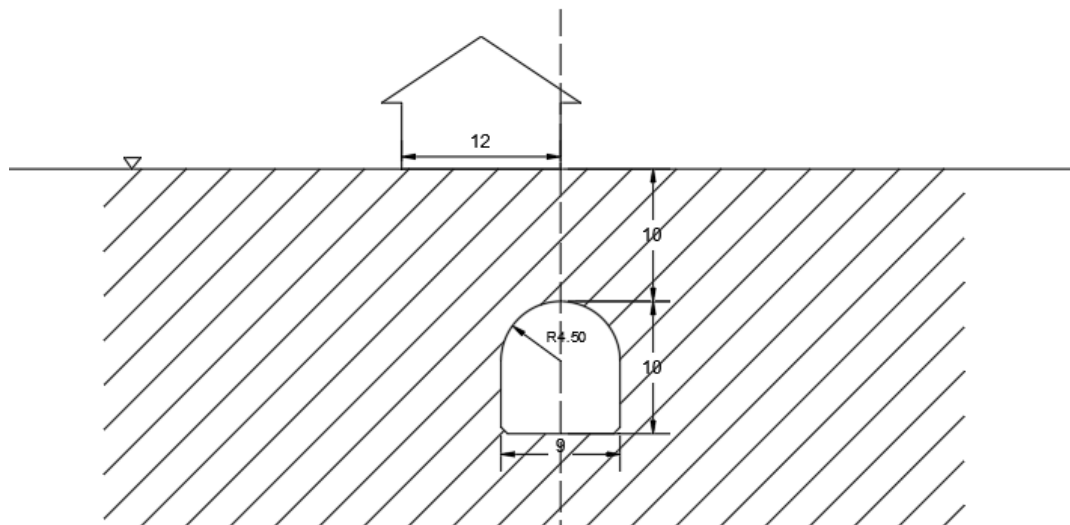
Vertical cross-section 2D sketch of the model showing a house located above an underground cavity
